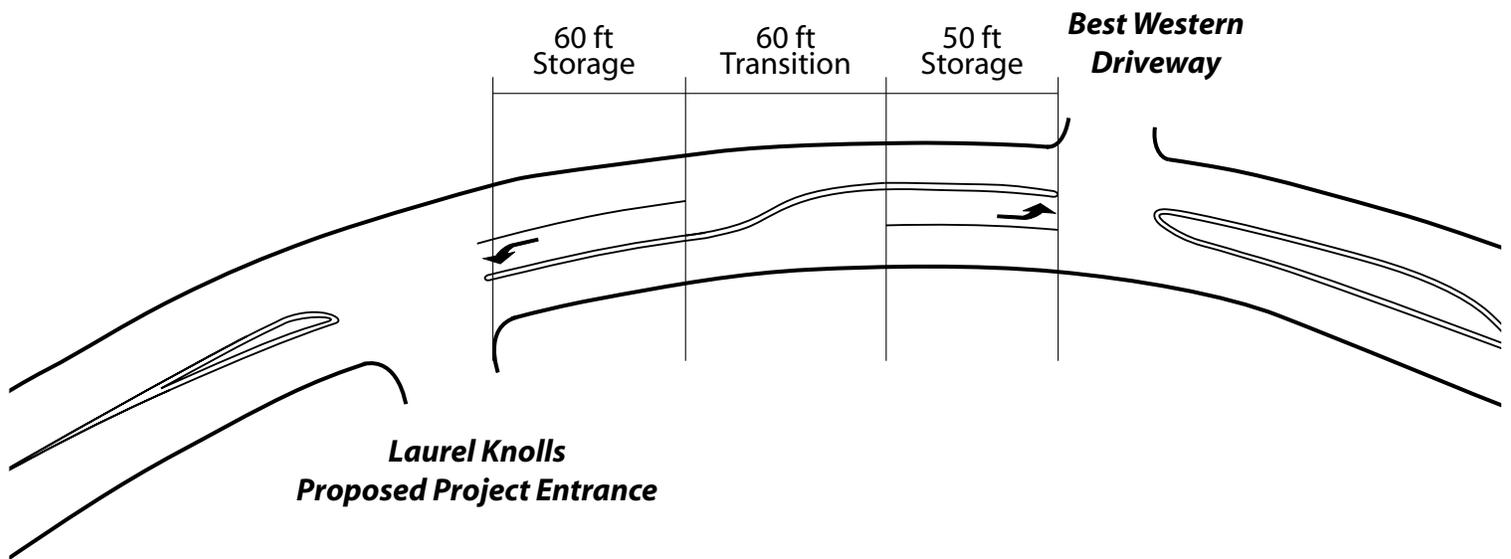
| PROPOSED CHANGES TO PAVEMENT MARKINGS
